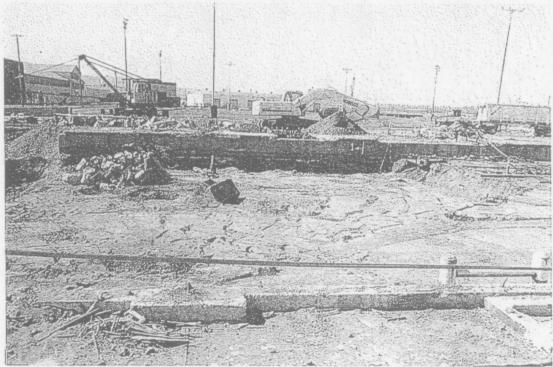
Shoring piles (typical of 9) vibrated 25 feet below ground surface along Front Avenue.
